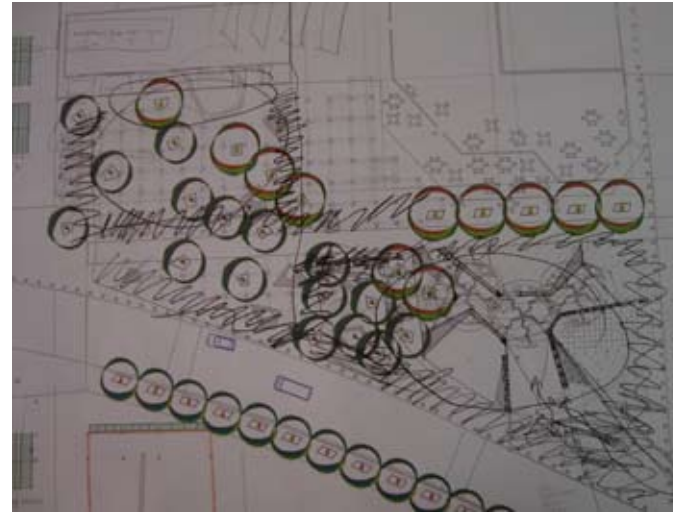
Proposed Zoning for Masterplan (Not to Scale, Author, 2009)
